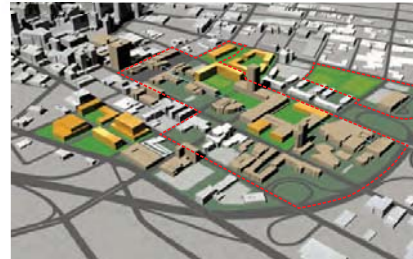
CSU Campus Master Plan Design Alternative 1
